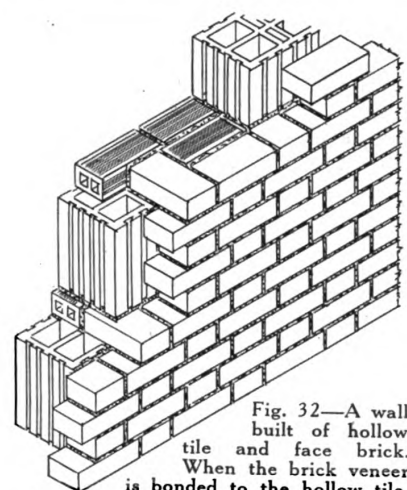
A wall built of hollow tile and face brick. When the brick veneer is bonded to the hollow tile, as shown, full bearing value for the total thickness of the wall is allowed. When the brick veneer is secured by metal ties only, the hollow tile backing alone can be considered as bearing thickness.
